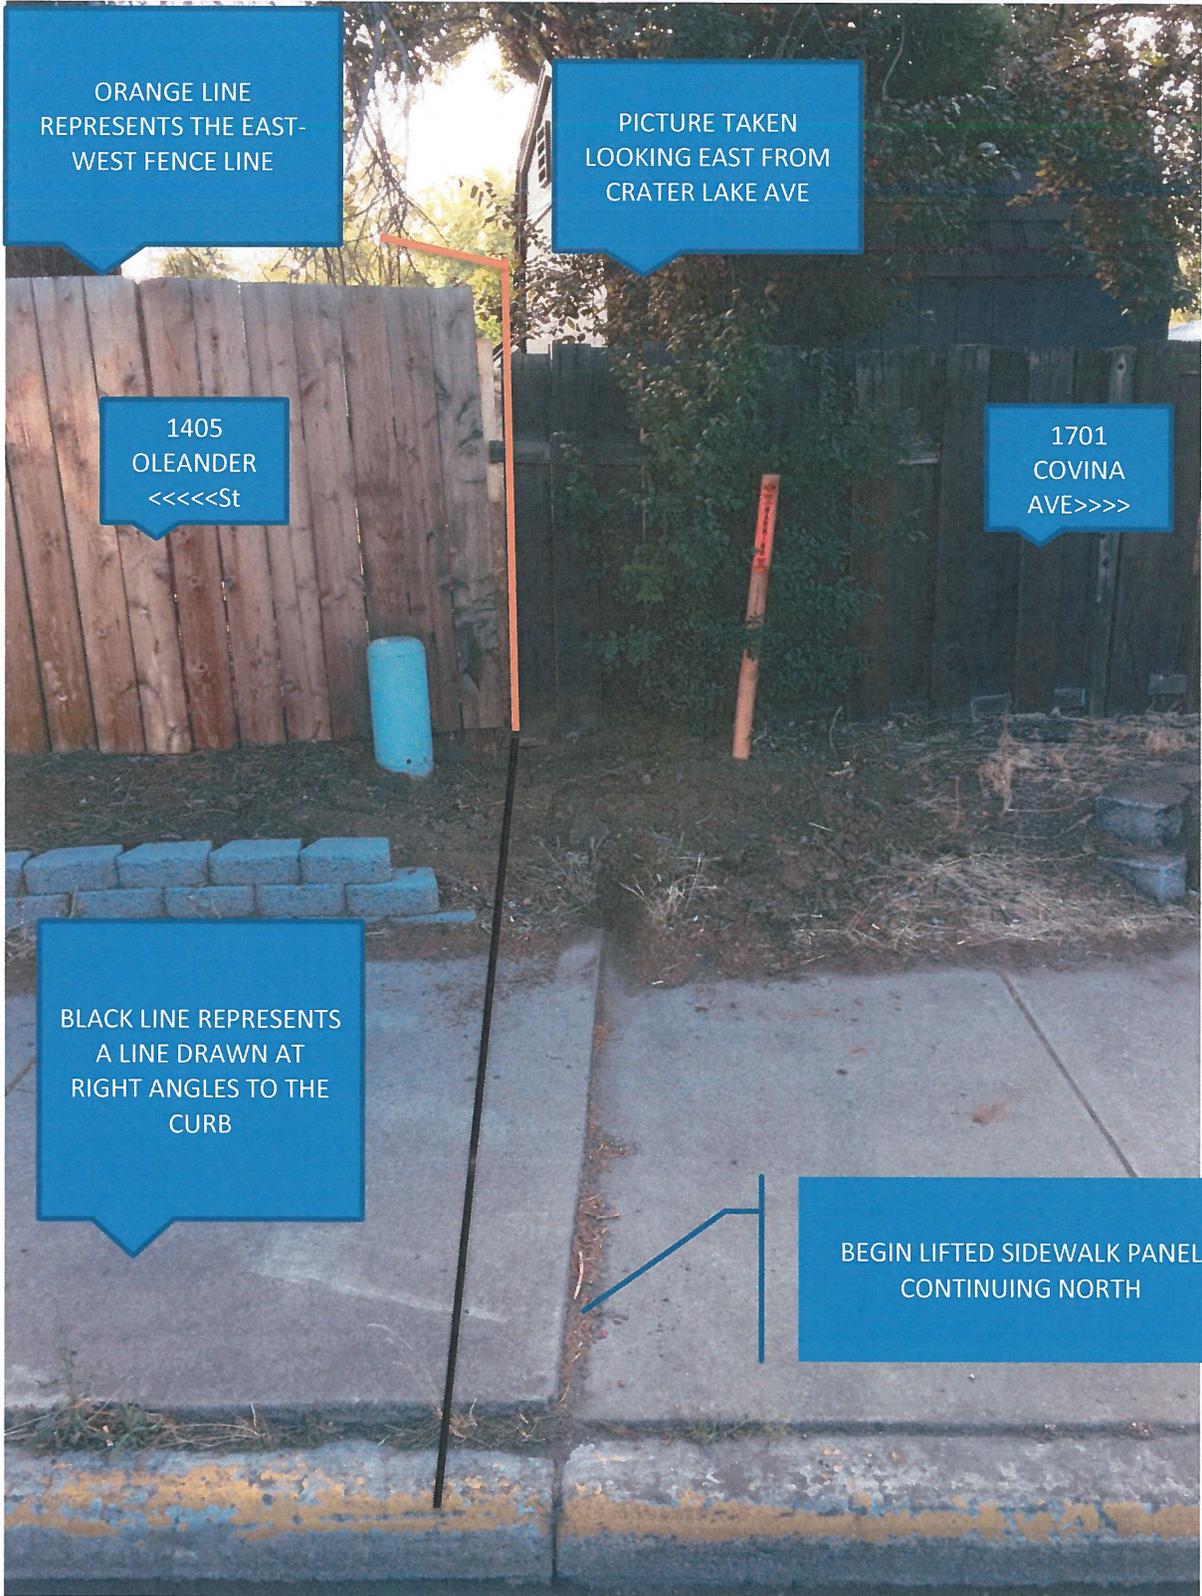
Photo taken on Covina showing sidewalk defect measurement
